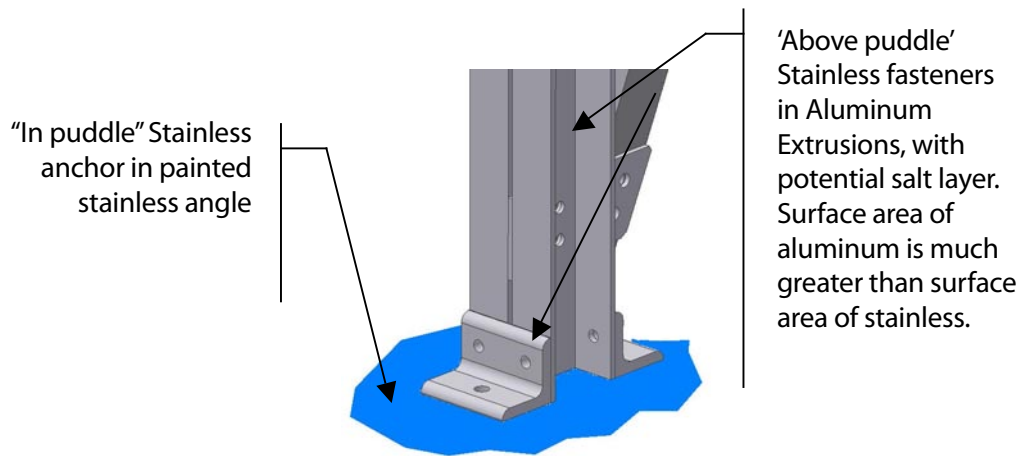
SHOWING TYPICAL FOOTING OF ENTECH STRUCTURES ‘IN PUDDLE’
